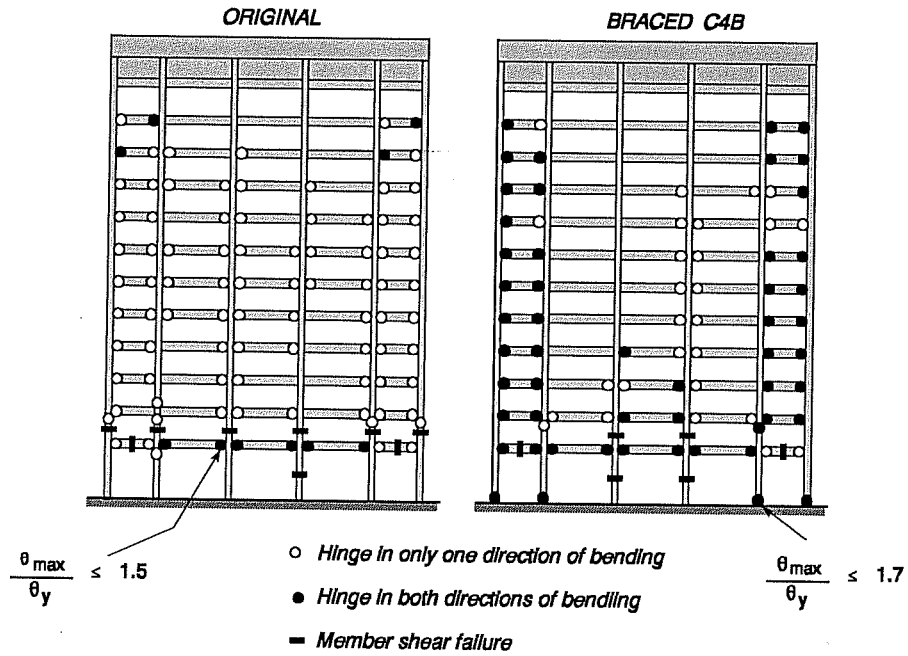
Hinge location for the perimeter frames of the original and braced building with configuration C4B. (Exterior bays are not drawn to scale for clarity)
